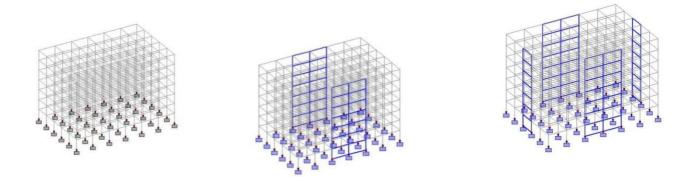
,2,3 - Model of G+6 building without a shear wall - M0, M1, M2
